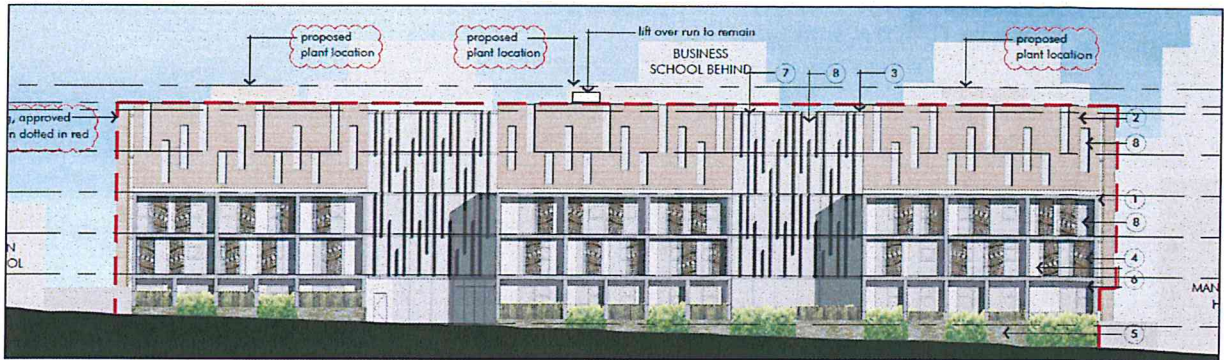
Proposed Abercrombie Street Elevation (approved outline shown in red)
